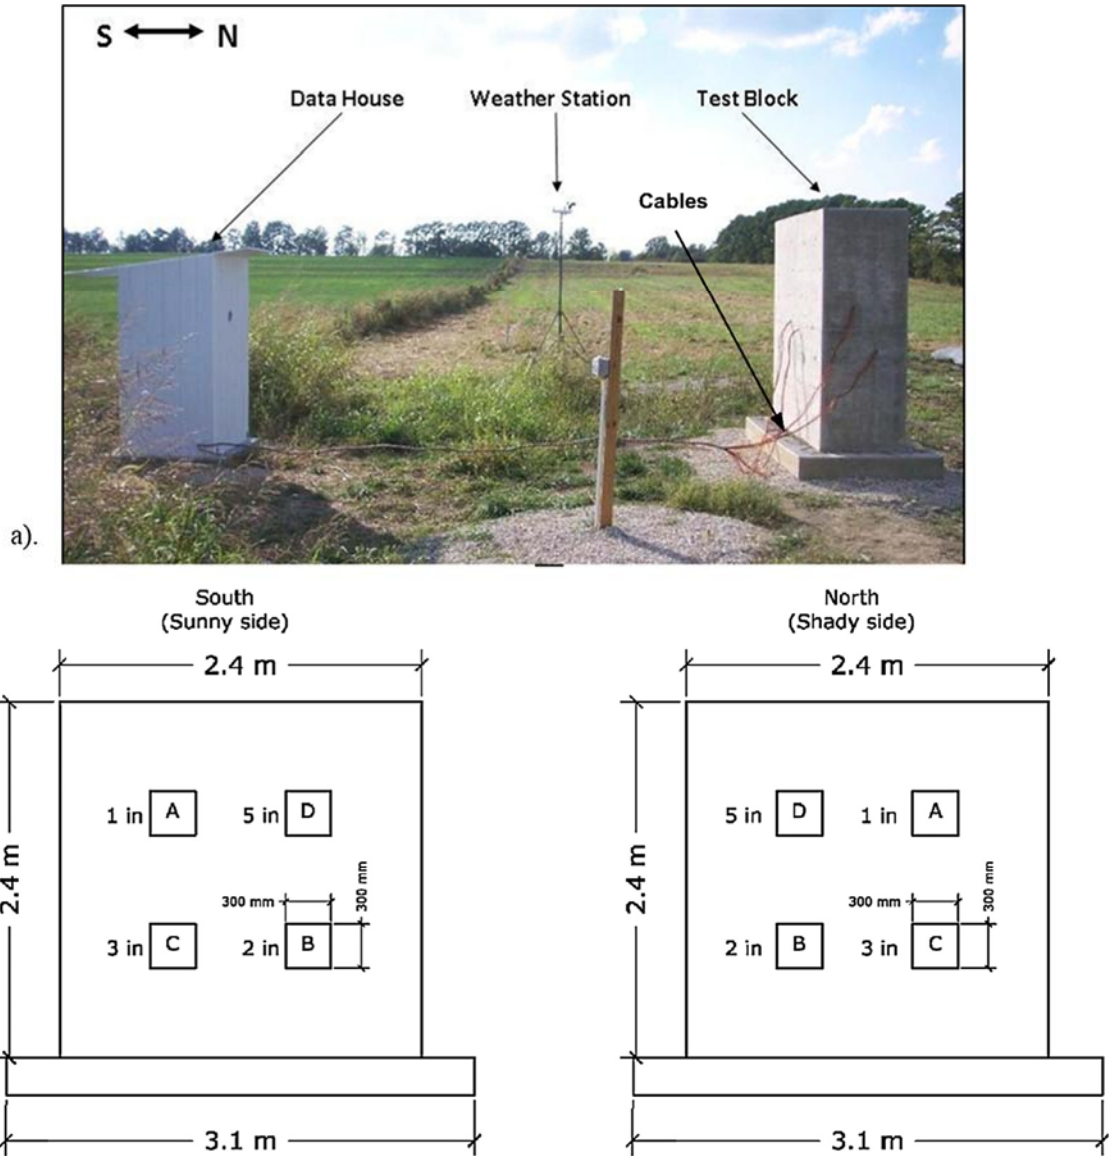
(a) Site layout and Concrete block with defect locations: (b) sunny side (south), (c) shady side (north).
